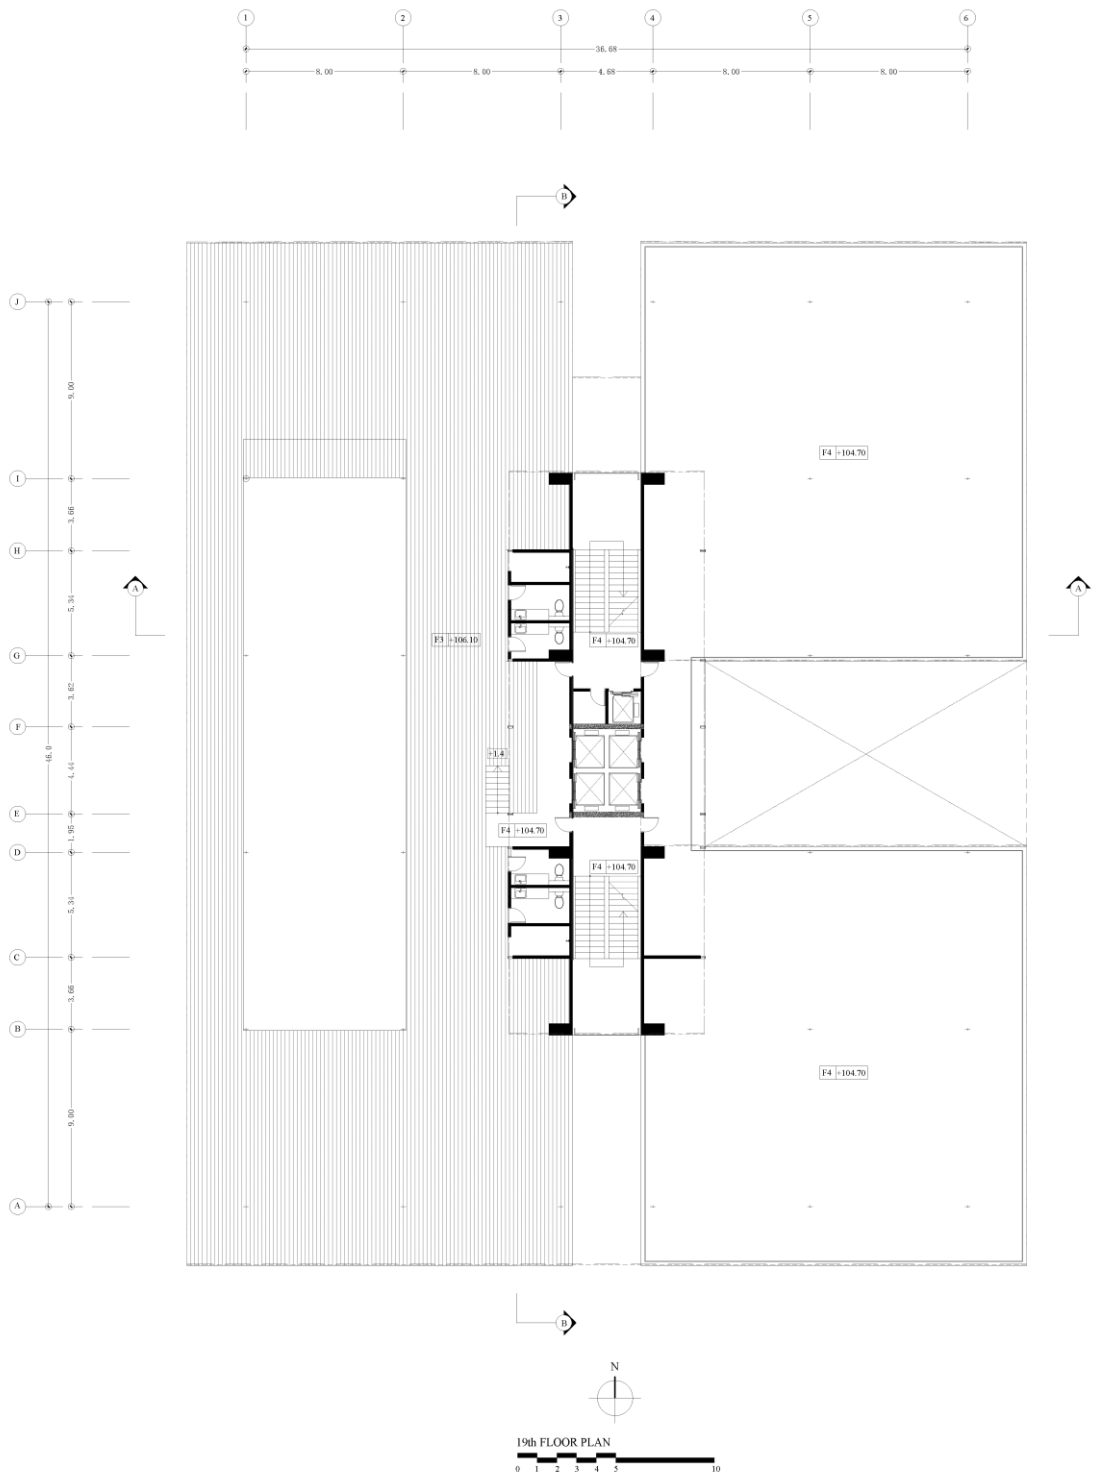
19th Floor Plan: Rooftop, drawn by the author.
